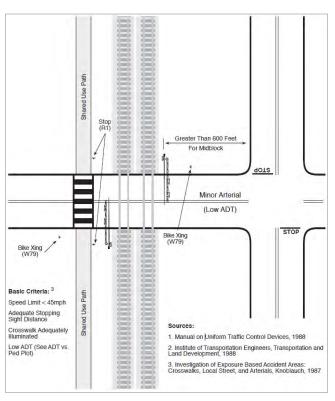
Roadway Crossing Type 2 (Unsignalized Crossing)
